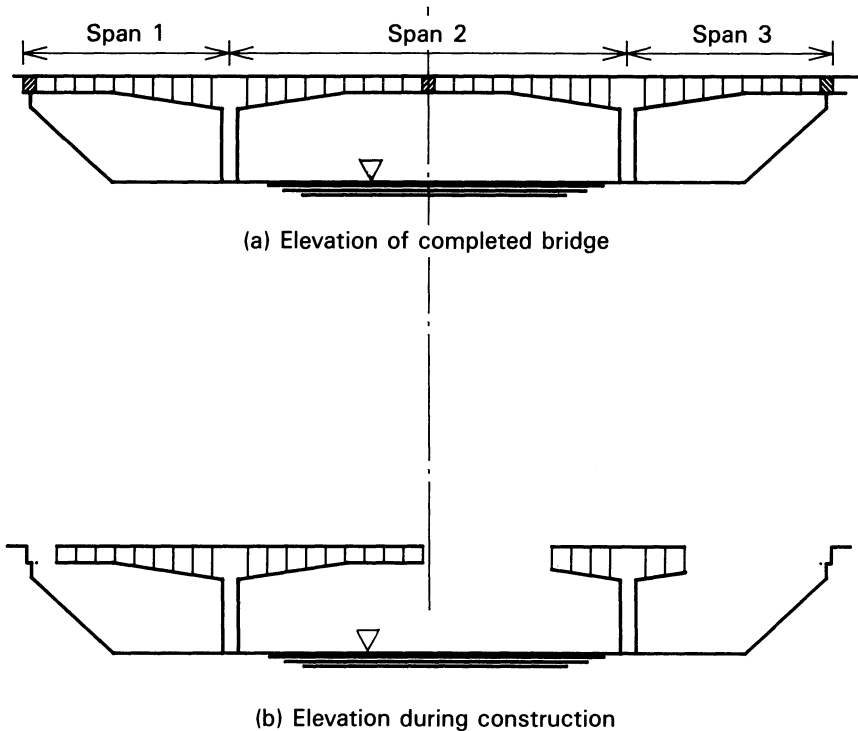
Principle of erecting bridges segmentally in cantilever. (a) Elevation of completed structure. (b) Elevation during construction.
